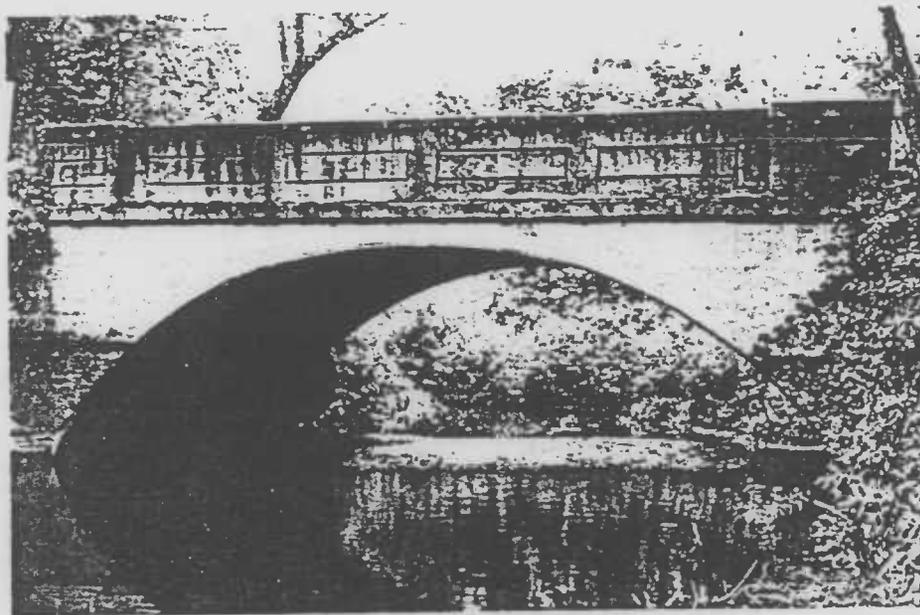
Typical single-span Luten barrel arch highway bridge. This type, patented by Daniel B. Luten, was built throughout Virginia.
